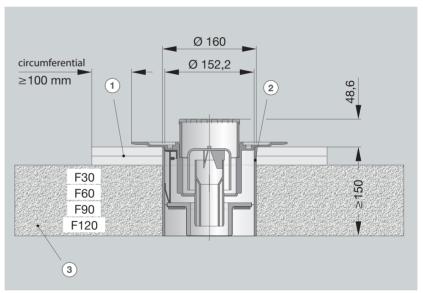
144 Advantix floor drain R120 – in drill hole with floor installation panels
